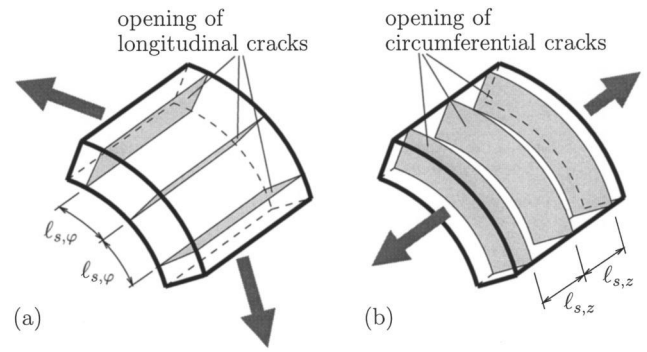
Material model for reinforced shotcrete: Illustration of cracks opening in shotcrete lining with average crack spacing in (a) circumferential and (b) longitudinal direction
